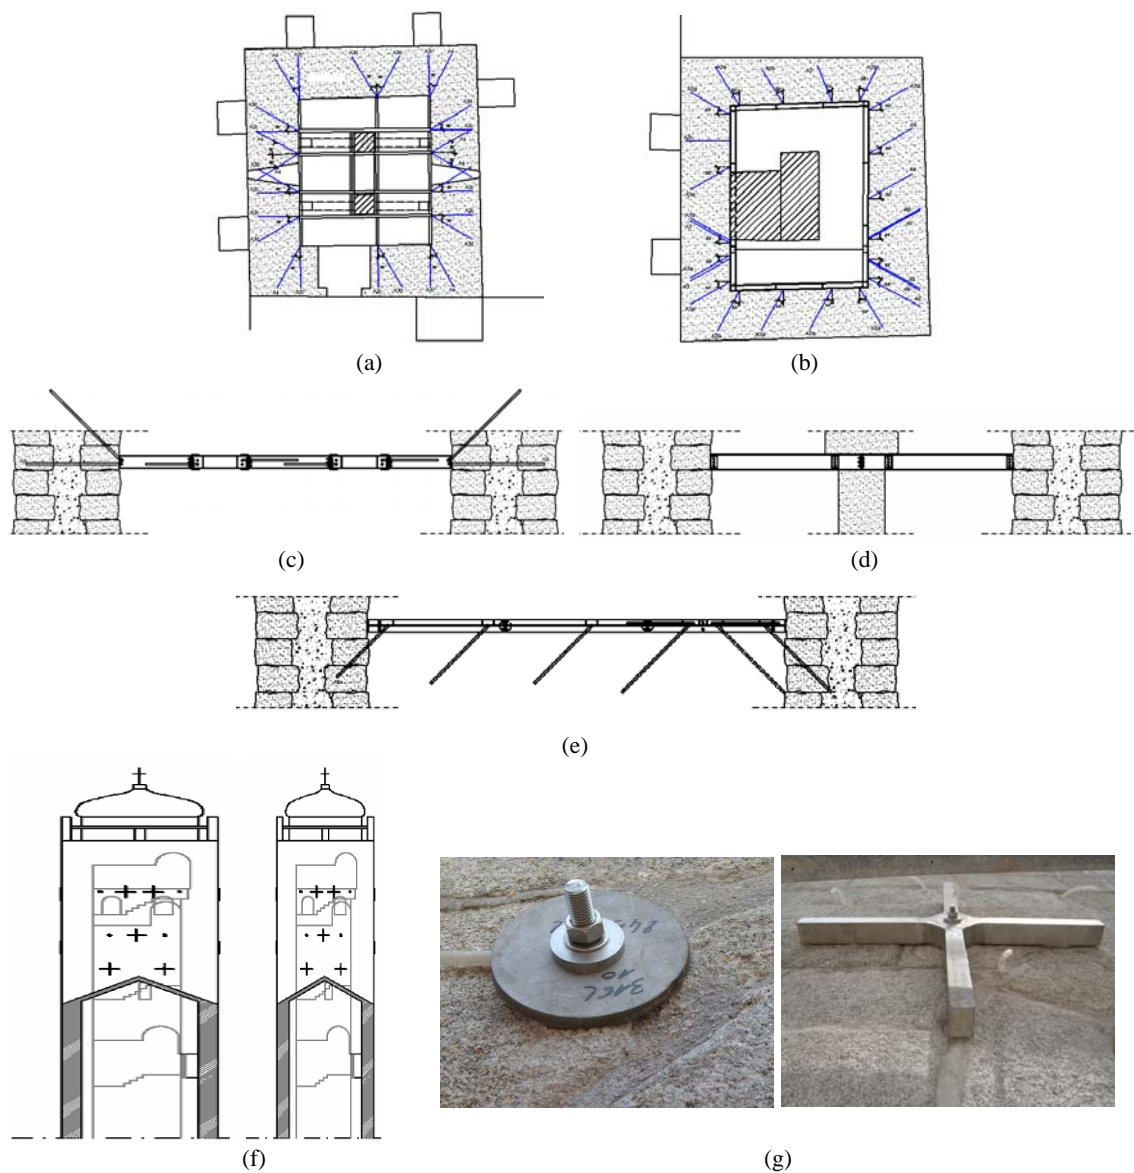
Aspect of the strengthening of the towers using stainless steel rings and long inclined anchorages: (a) plan of the ring for the North tower; (b) plan of the ring for the South tower; (c) North-South section for North tower; (d) West-East section for North tower; (e) typical section for South tower; (f) additional ties placed in the West and South façades of the South tower; (g) details of the anchorage plates.
